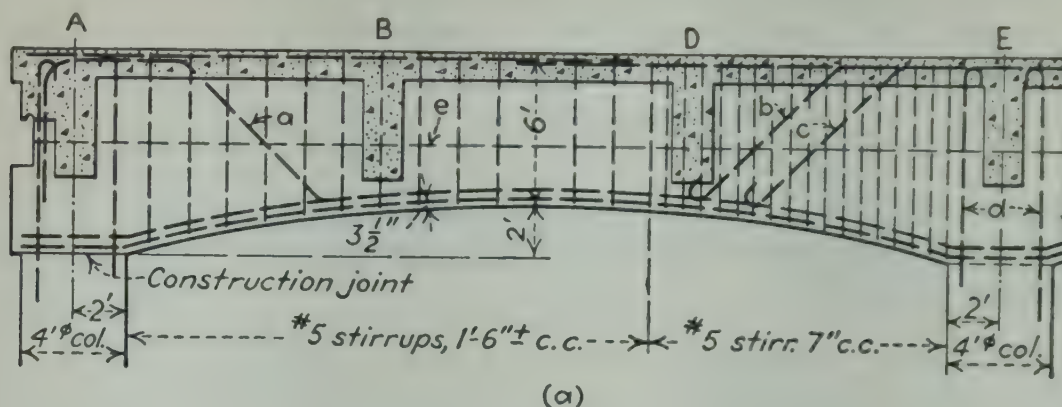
Girder used in New Jersey approach to Lincoln Tunnel, New York City.
